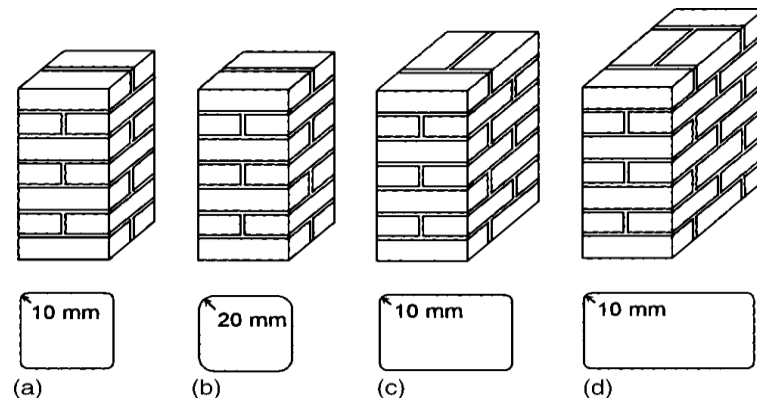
Sectional elevation of typical concrete jacketed brick masonry columns (Kog et al., 2001)
